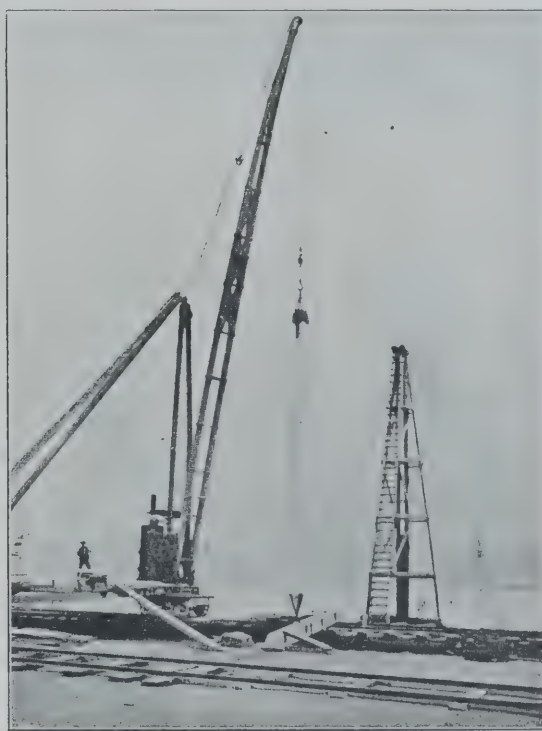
CONCRETE PILE BEING SLUNG WITH RANSOME HELMET.
